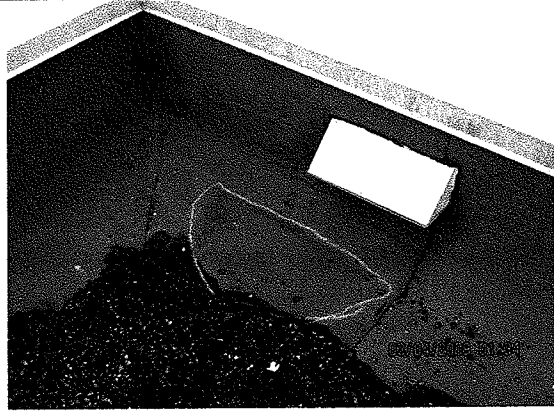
There seems to be water, or air, trapped between the SBS stripping and the existing asphalt and gravel roof. This should be opened up and examined to determine where it is coming from.
